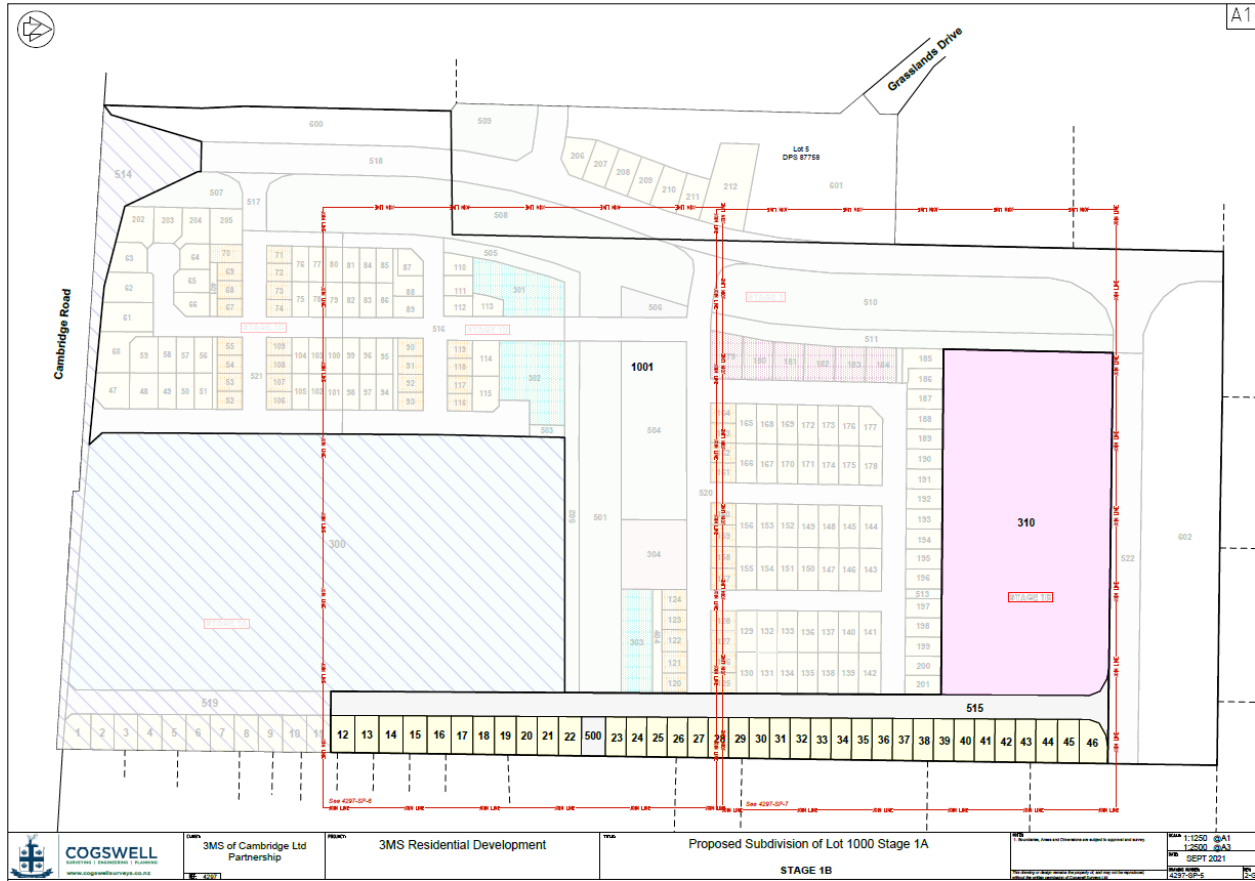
Proposed scheme plan showing extent of Stage 1B.
